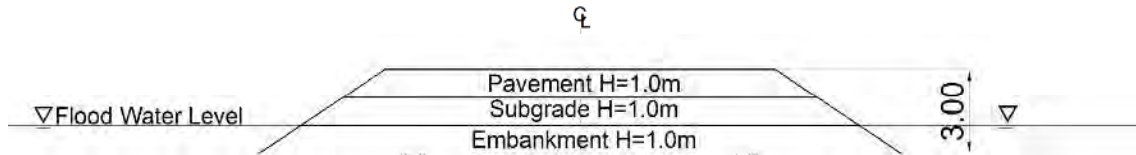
Conceptual Cross Section for Low Embankment
